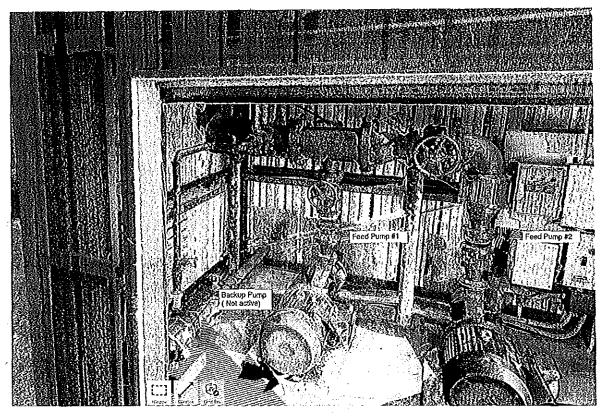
Internal View of the Ricardo pump station #1 pump room – Pump Connection Layout from ICE Survey 3D Scan, June 2025.
